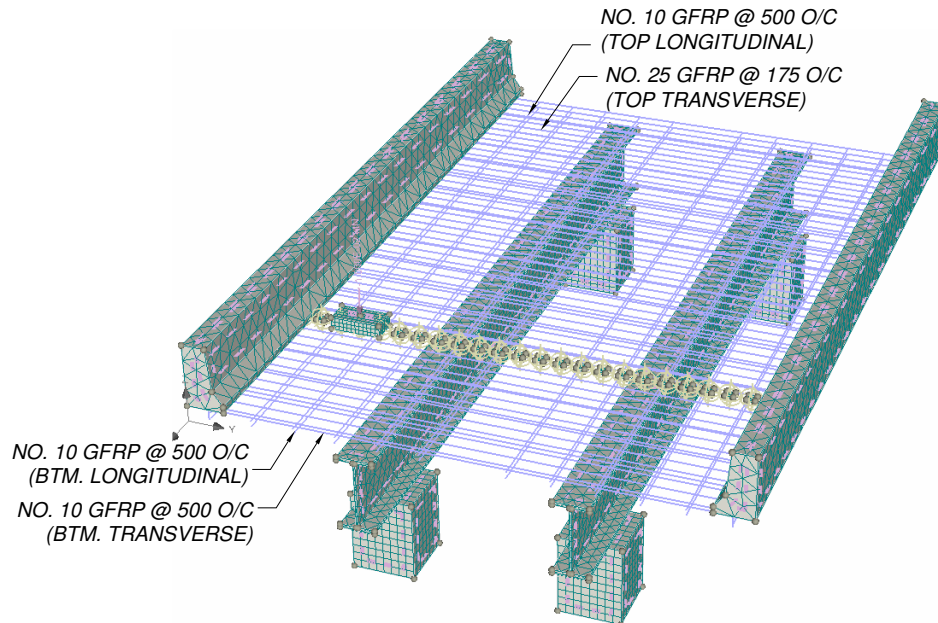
Isometric view of the discrete modeling of internal reinforcement for the cantilever section with GFRP reinforcement
